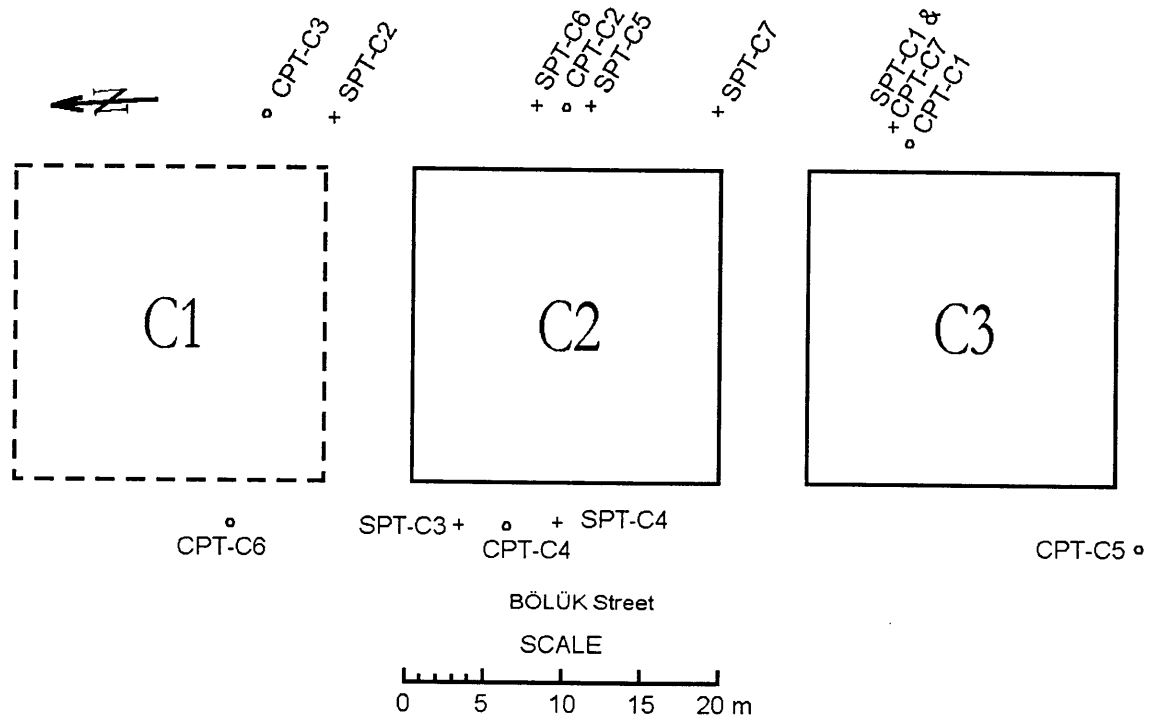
Plan view of Site C and location of subsurface exploration points
